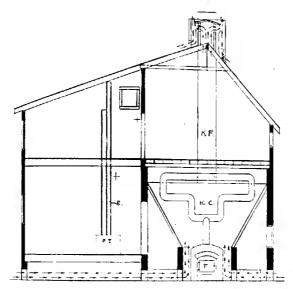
Fig. XVII.—Sectional End View of Building, showing Jacket-and-Hopper Construction.
